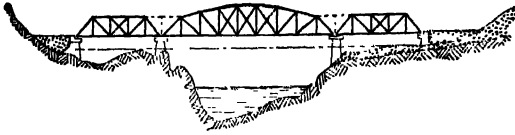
Layout of a Simple-truss Bridge Erected as a Cantilever.
